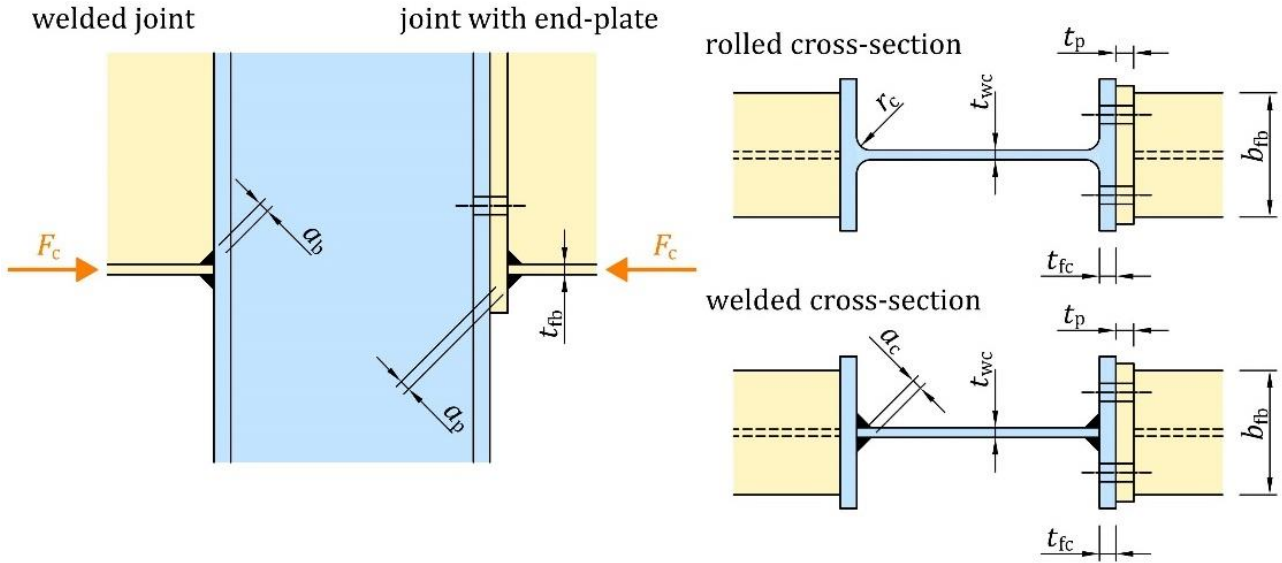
EN 1993-1-8: Transverse compression – welded joint and joint with end-plate
